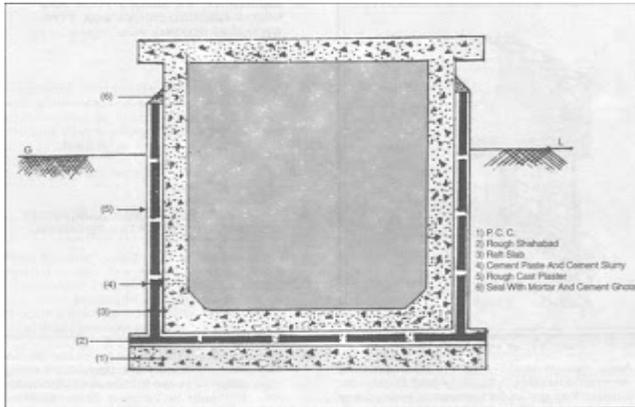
Box type waterproofing for basements (image source: <http://constructionduniya.blogspot.in/2012/02/waterproofing-in-basements.html>)
